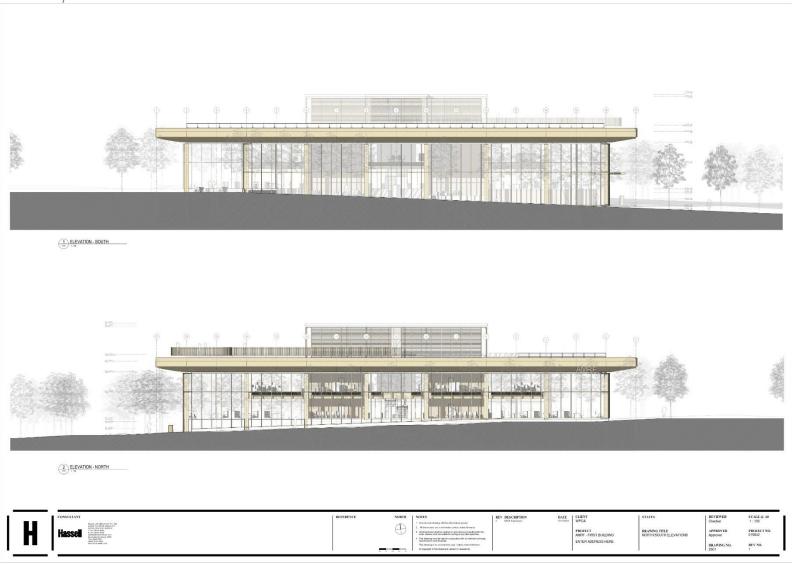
AMRF – First Building north-south elevations (Architectural drawings prepared by Hassell, 2021).
